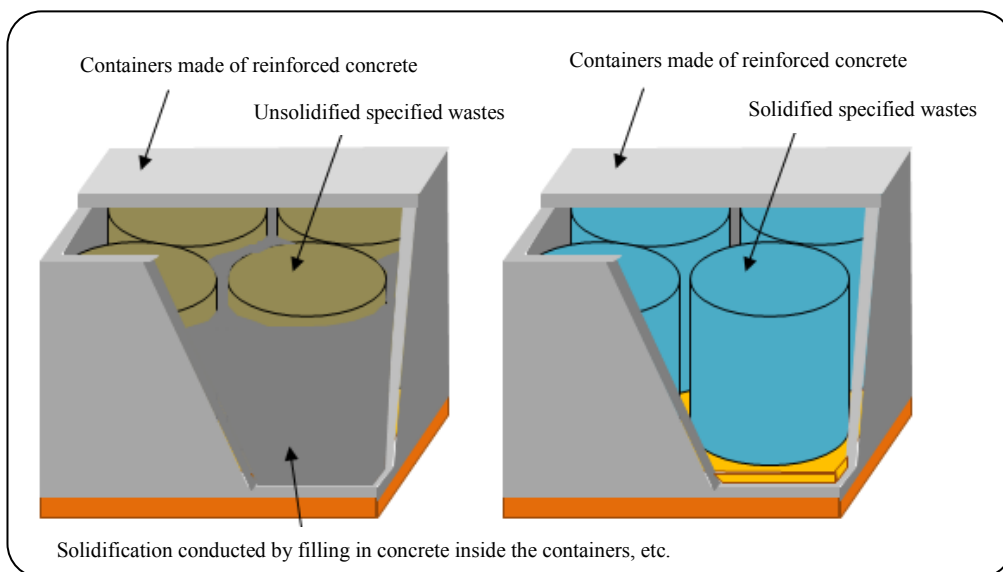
Landfill Disposal by Storing in Containers made of Reinforced Concrete (Example)
